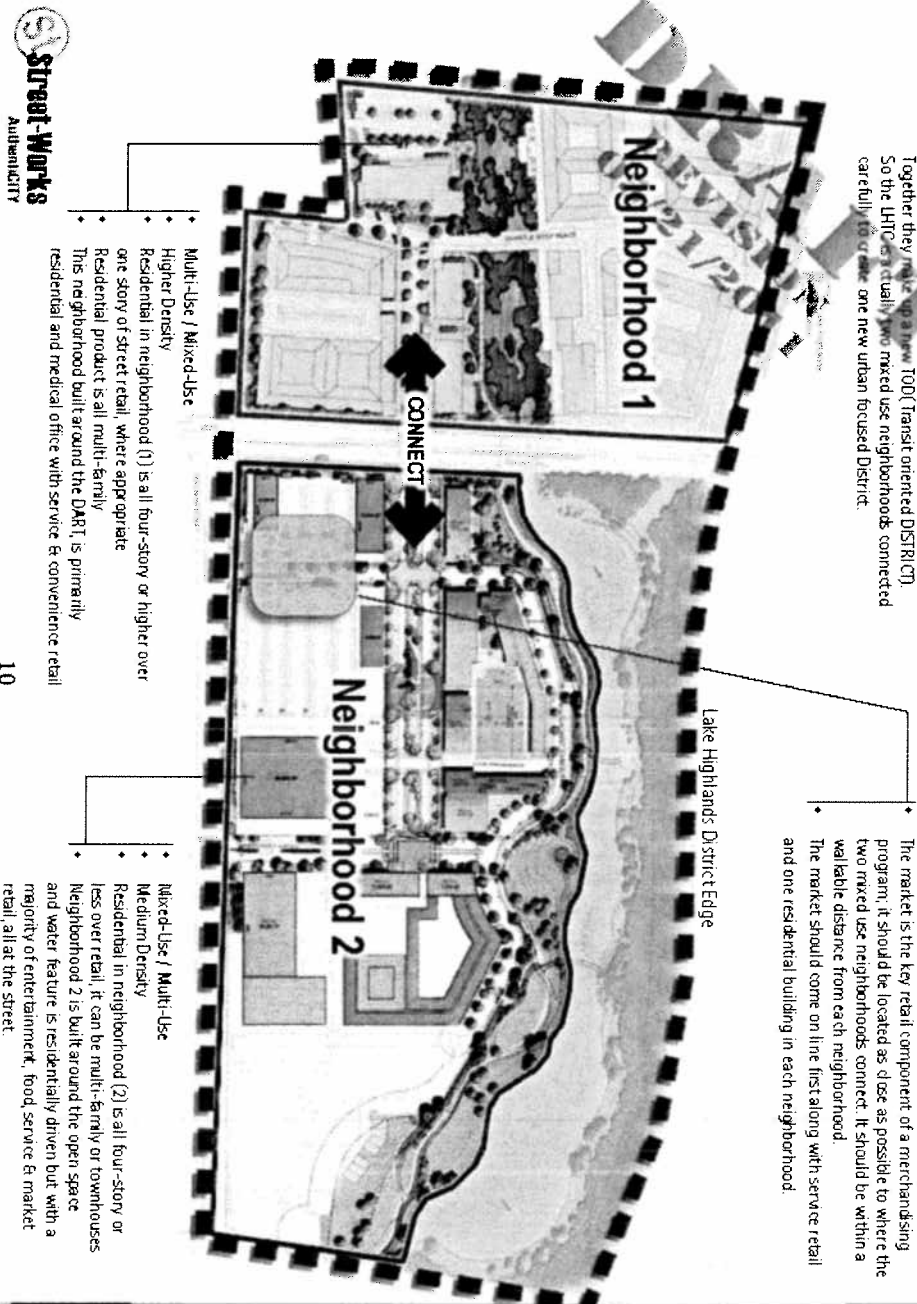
Exhibit B Lake Highlands Town Center (LHTC) Conceptual Site Plan
